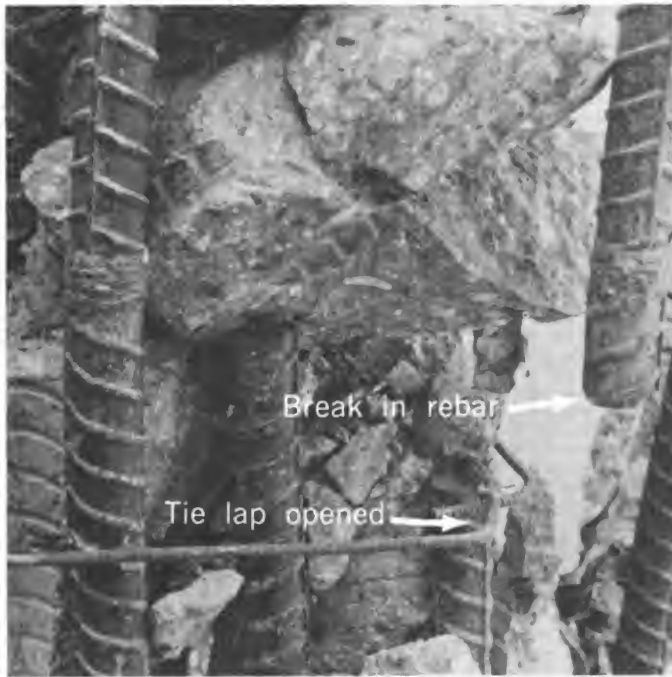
Olive View Hospital, medical treatment and care unit. Fracture detail of reinforcing bars near a full-penetration butt weld for column in figure 28. Note opening of column tie laps at corner.
